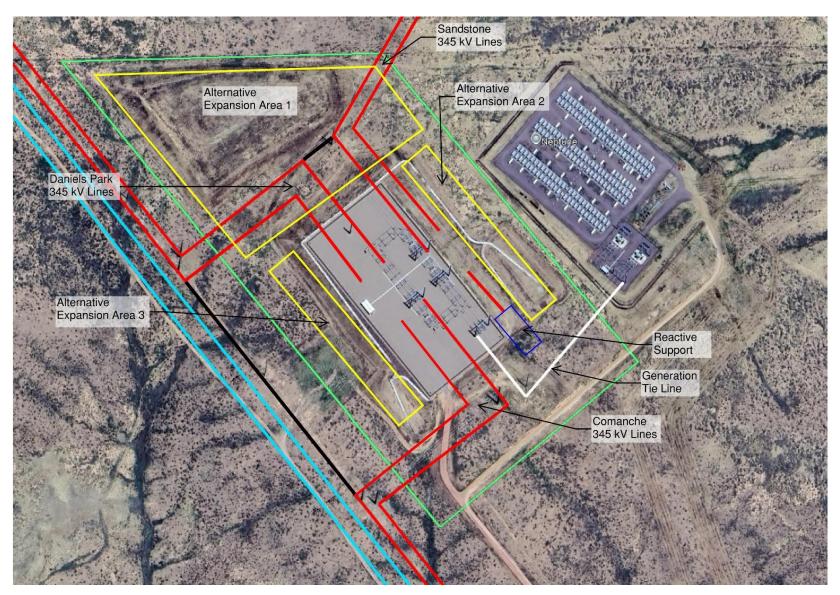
Conceptual Tundra 345 kV Expansion Area Plan
